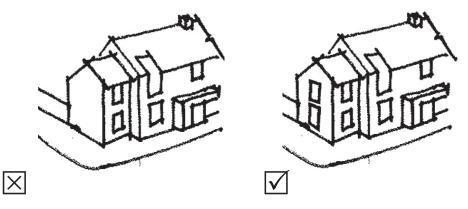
Extensions where side elevations face the street should incorporate windows to provide passive surveillance
